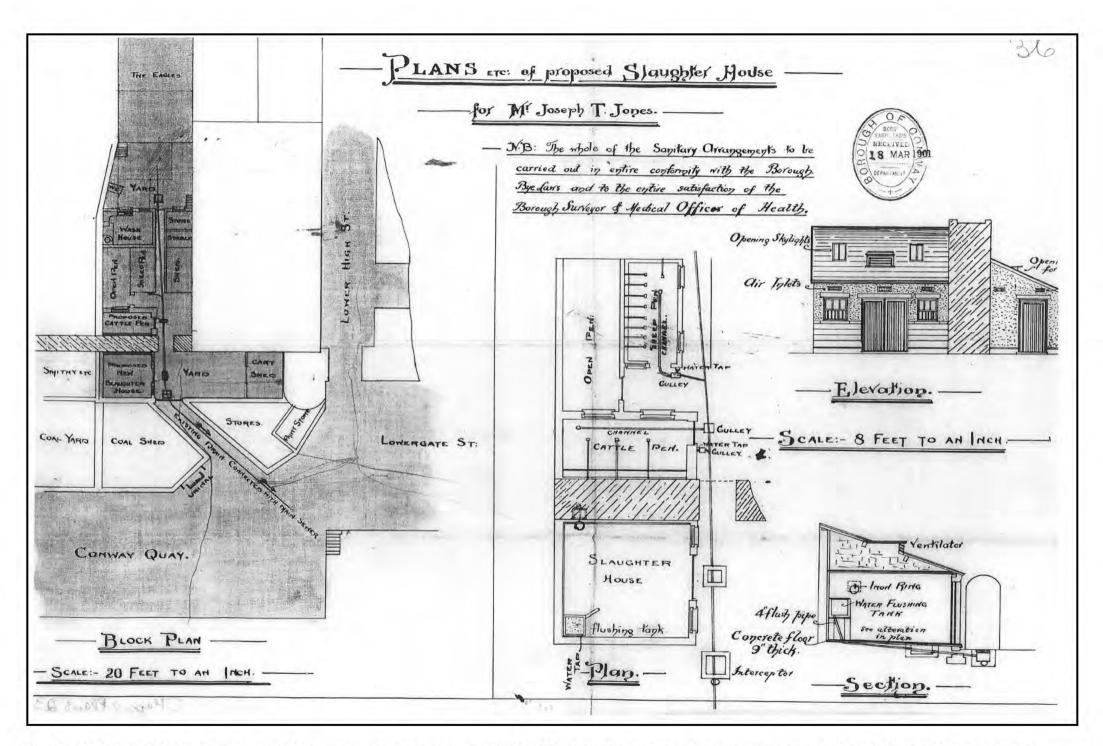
YARD 6 (PRN 30474): Building 08 (PRN 30476): reproduction of architect's plan CMP 23/2/44, received by the Borough Engineer's Department on the 18th March 1901 for Building 08
